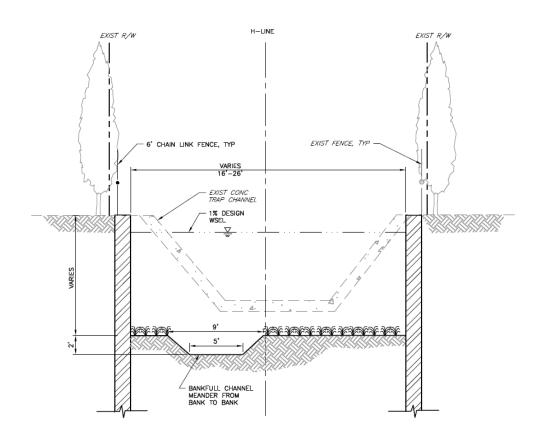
Section view comparing 90% design of Hale Creek to existing conditions
